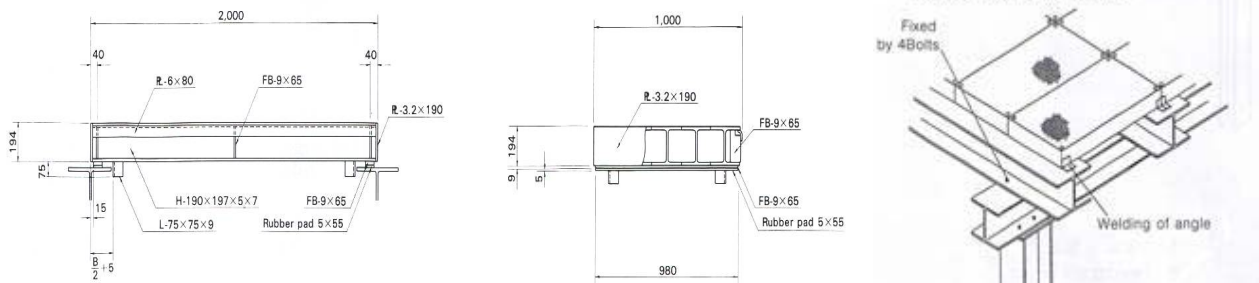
Typical steel decking elevation (L), end view (C) and installed (R) (Hirose, c.1996).
